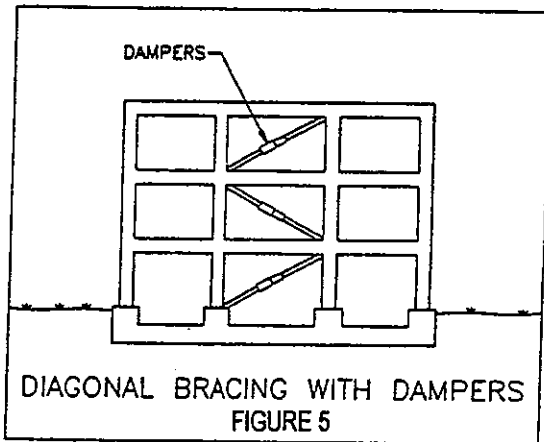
shows the incorporation of a fluid viscous damper into the diagonal element connecting a beam-column joint at one level of a moment frame structure to the adjacent beam-column joint at the next level. Connections of this nature can be designed into a new structure, or could be added to an existing structure. This was done in the case of the Stockton City Hall refurbishment, described later in this paper. Figure 6 shows a detail of this particular configuration. Figure 7 shows another way that fluid viscous dampers can be installed in diagonal braces.
